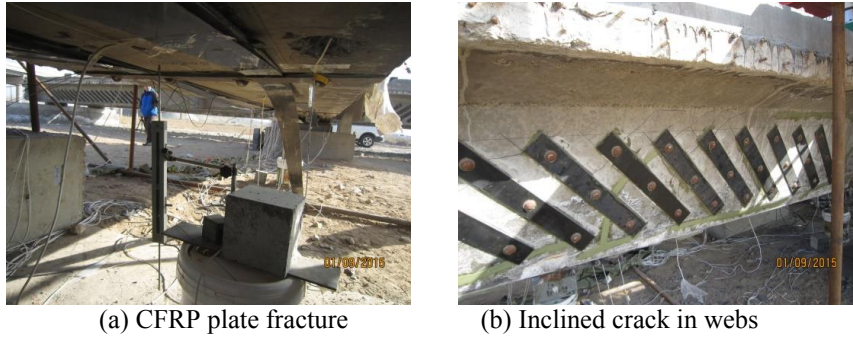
Failure characteristic of test girder strengthened by prestressed CFRP and gluing steel plate
